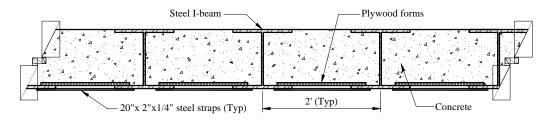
Beam-in-slab bridge system (1 in.=25.4mm)
